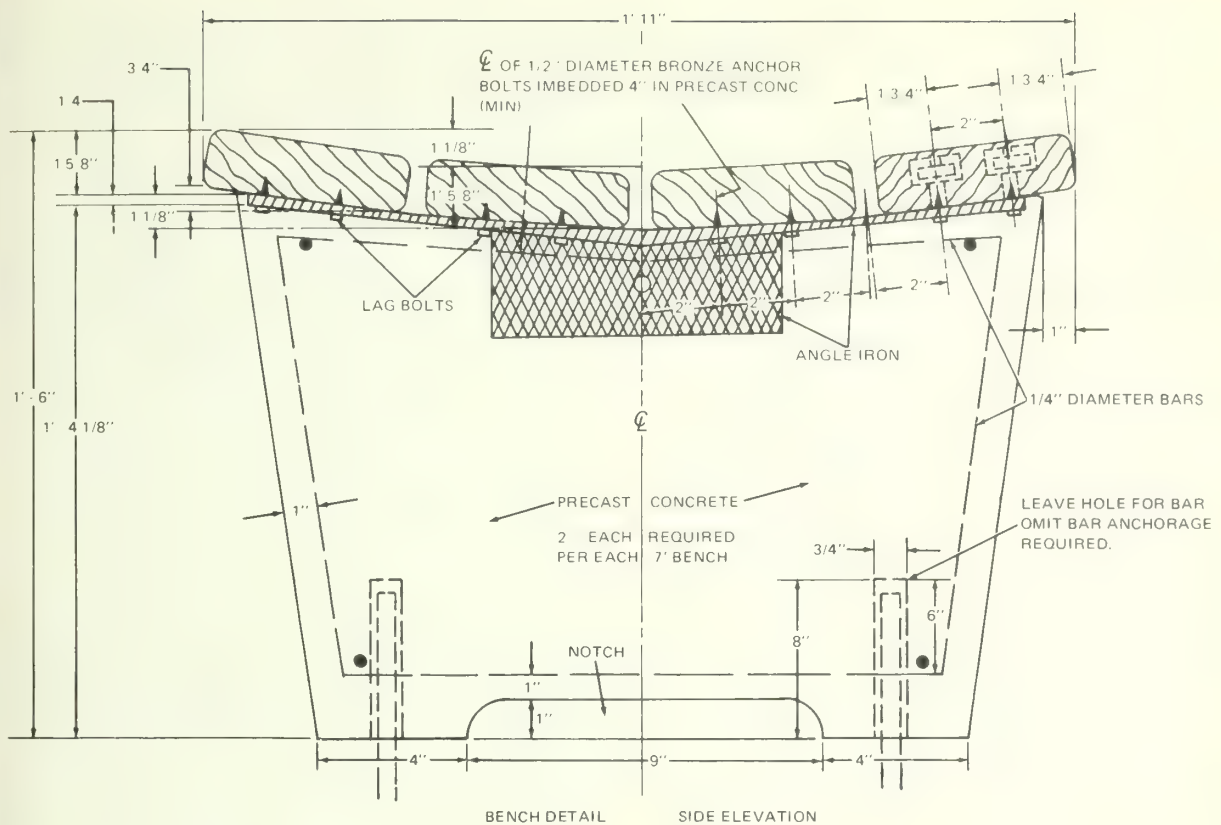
Campus bench using four 1 5/8- by 5 1/2- by 84-in. red oak or hickory slats on concrete legs. The slats are lag bolted from the bottom to an angle iron attached to concrete legs at each end of the bench. The concrete legs have a concave shape on the top so that each slat is pitched slightly from the horizontal plane. This prevents water from standing on the slat and thus helps in drying.
